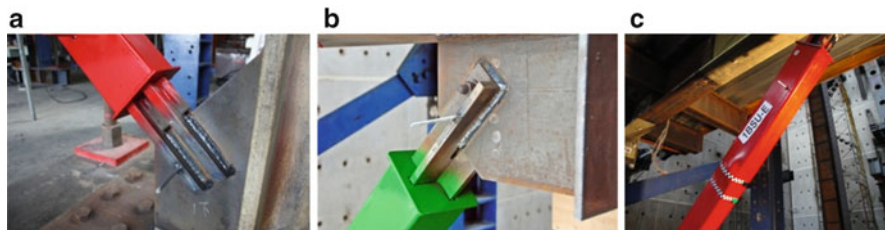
The connection detail of the (a) thin BRB, (b) the welded end-slot BRB, and (c) the local bulging failure of Specimen 1BRB-1S
